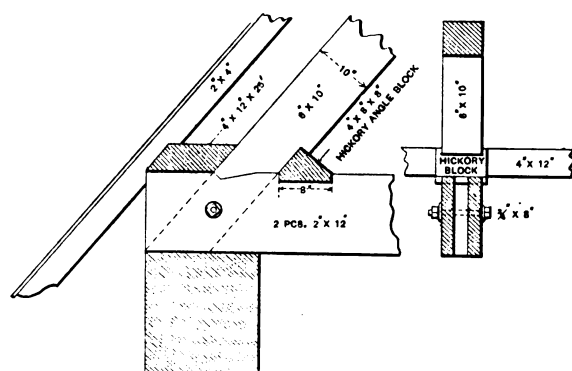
Details at A of Previous Figure.—Scale, 1/4 Inch to the Foot.
